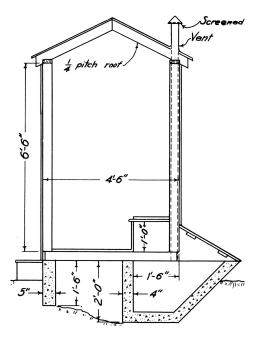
Where the soil is very open or where an earth pit privy would endanger the water supply, a water-tight concrete vault privy is recommended.
